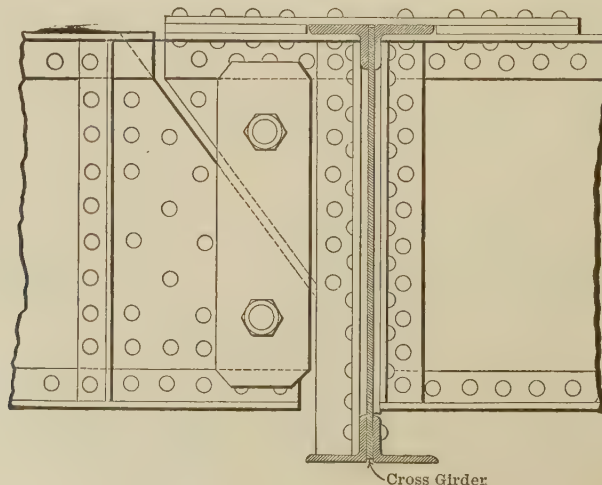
EXPANSION JOINT, ELEVATED RAILROAD.
